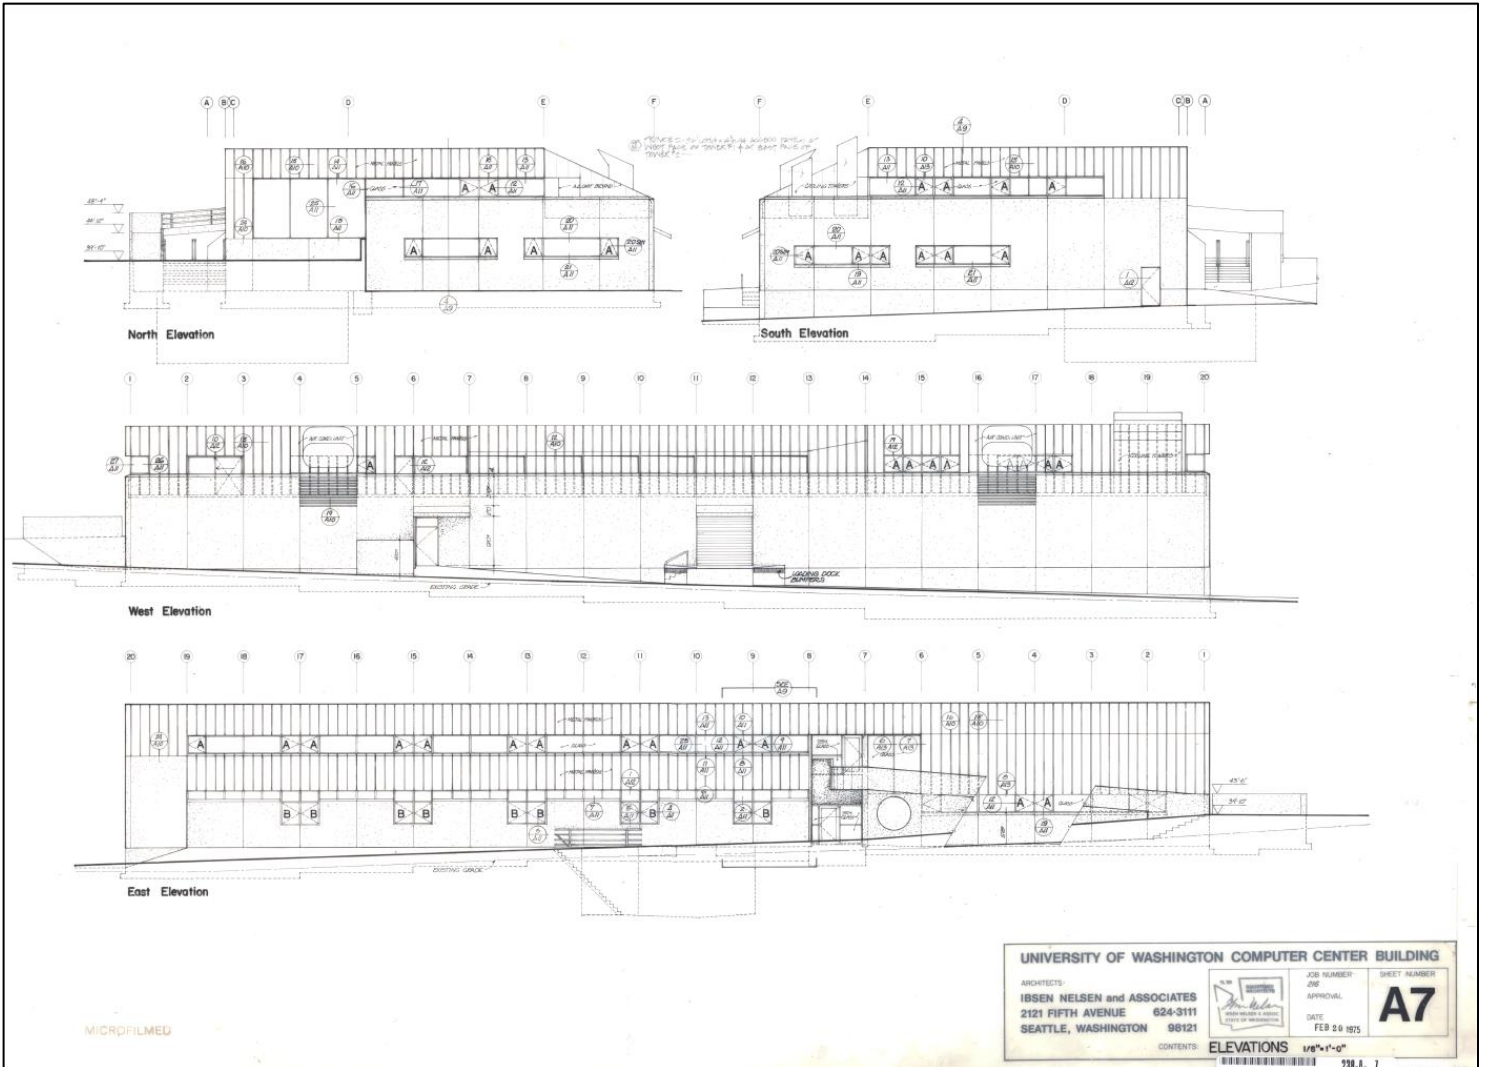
Elevations, Sheet A7, Sheet A5 from the 1975 drawing set.
